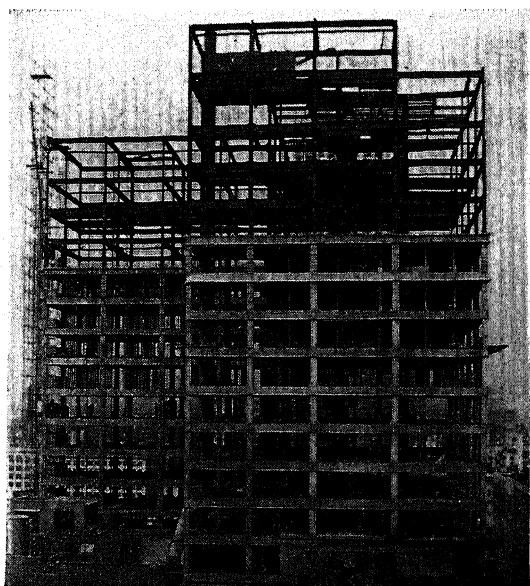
Thirteen-story addition to Chamber of Commerce Building, Houston, Texas. Fifteen tons of steel. Shop riveted. Field welded for noiseless construction. Includes 8,000 ft. of welded joints.
